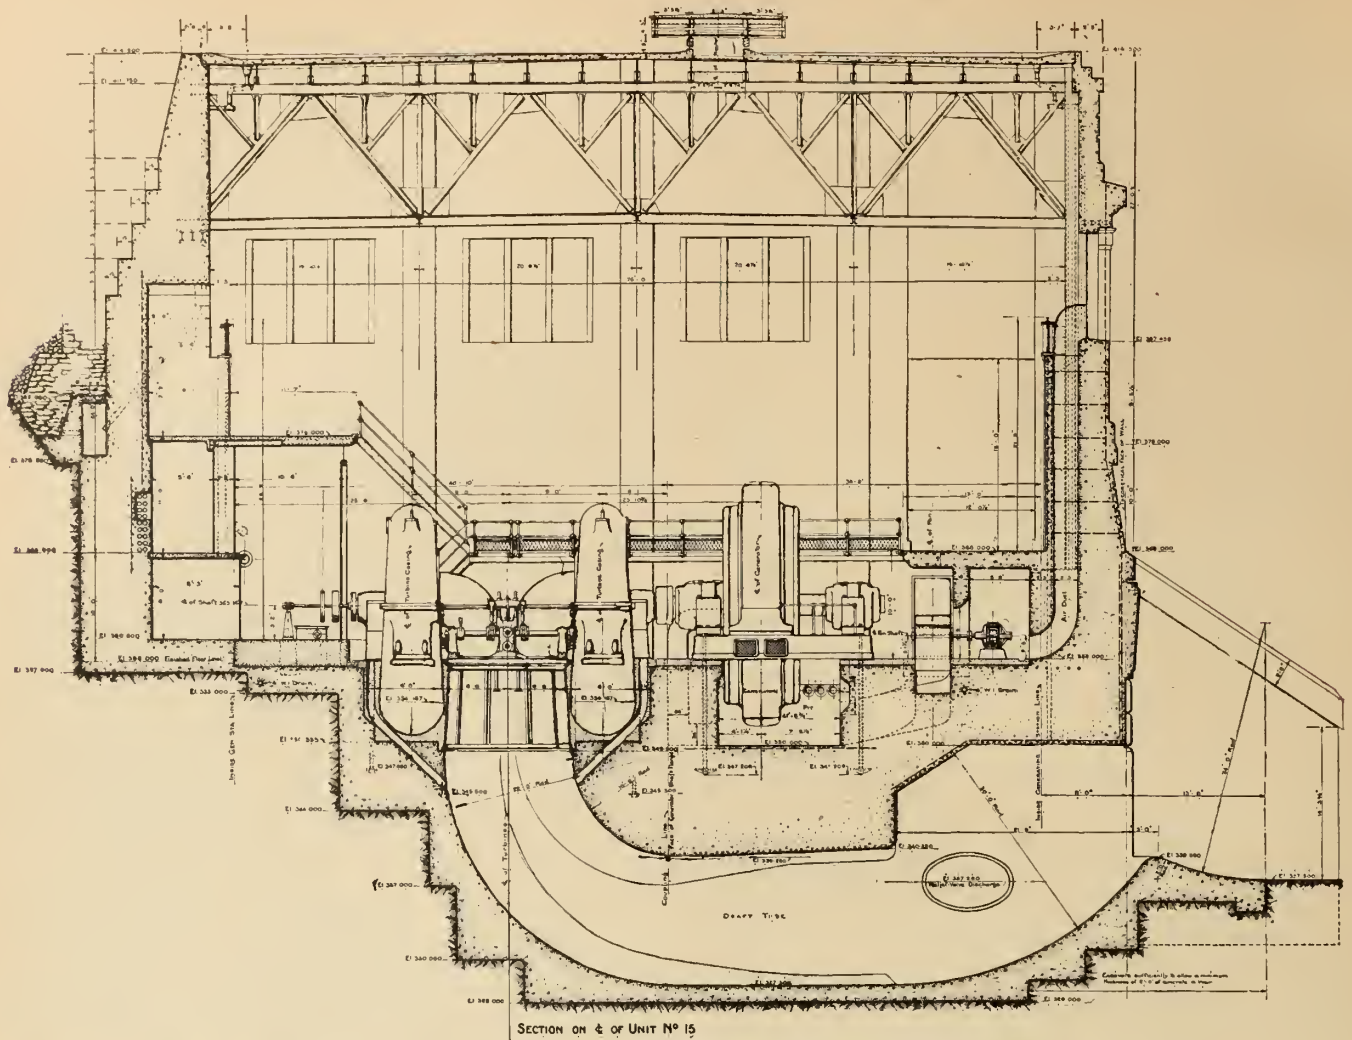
Horizontal Setting with Large Pillow-blocks Bearings.
